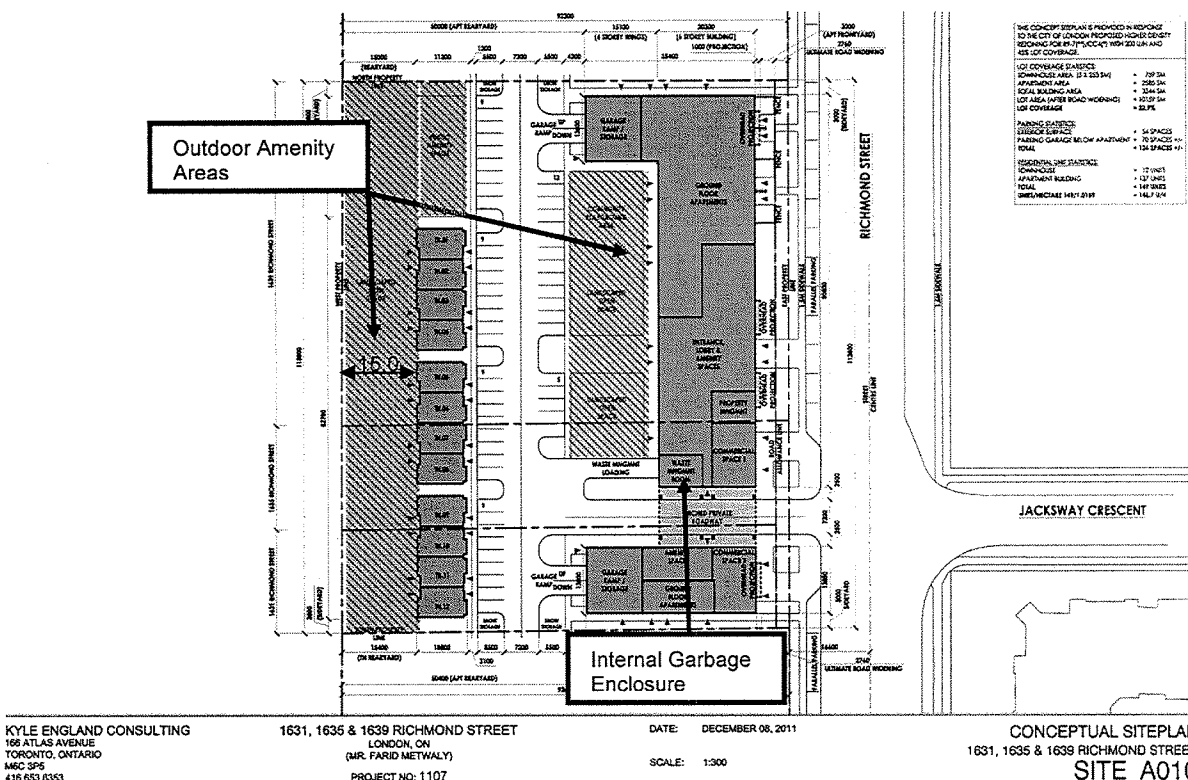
Site plan drawing for the development of the properties located at 1631, 1635, and 1639 Richmond Street
